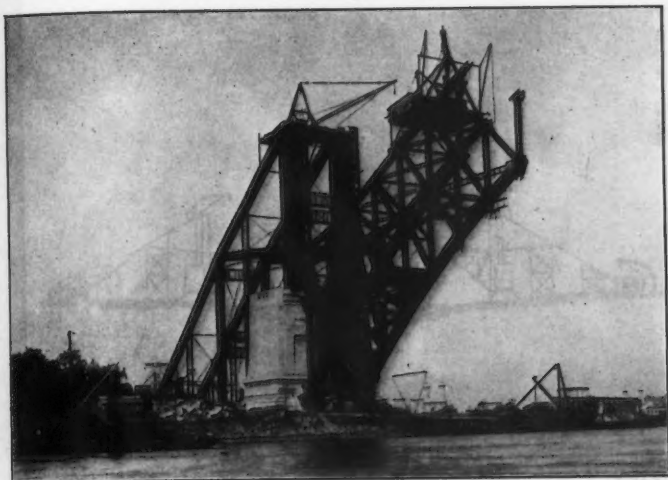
HELL GATE BRIDGE: ERECTION STAGE, AUGUST 18TH, 1915,
